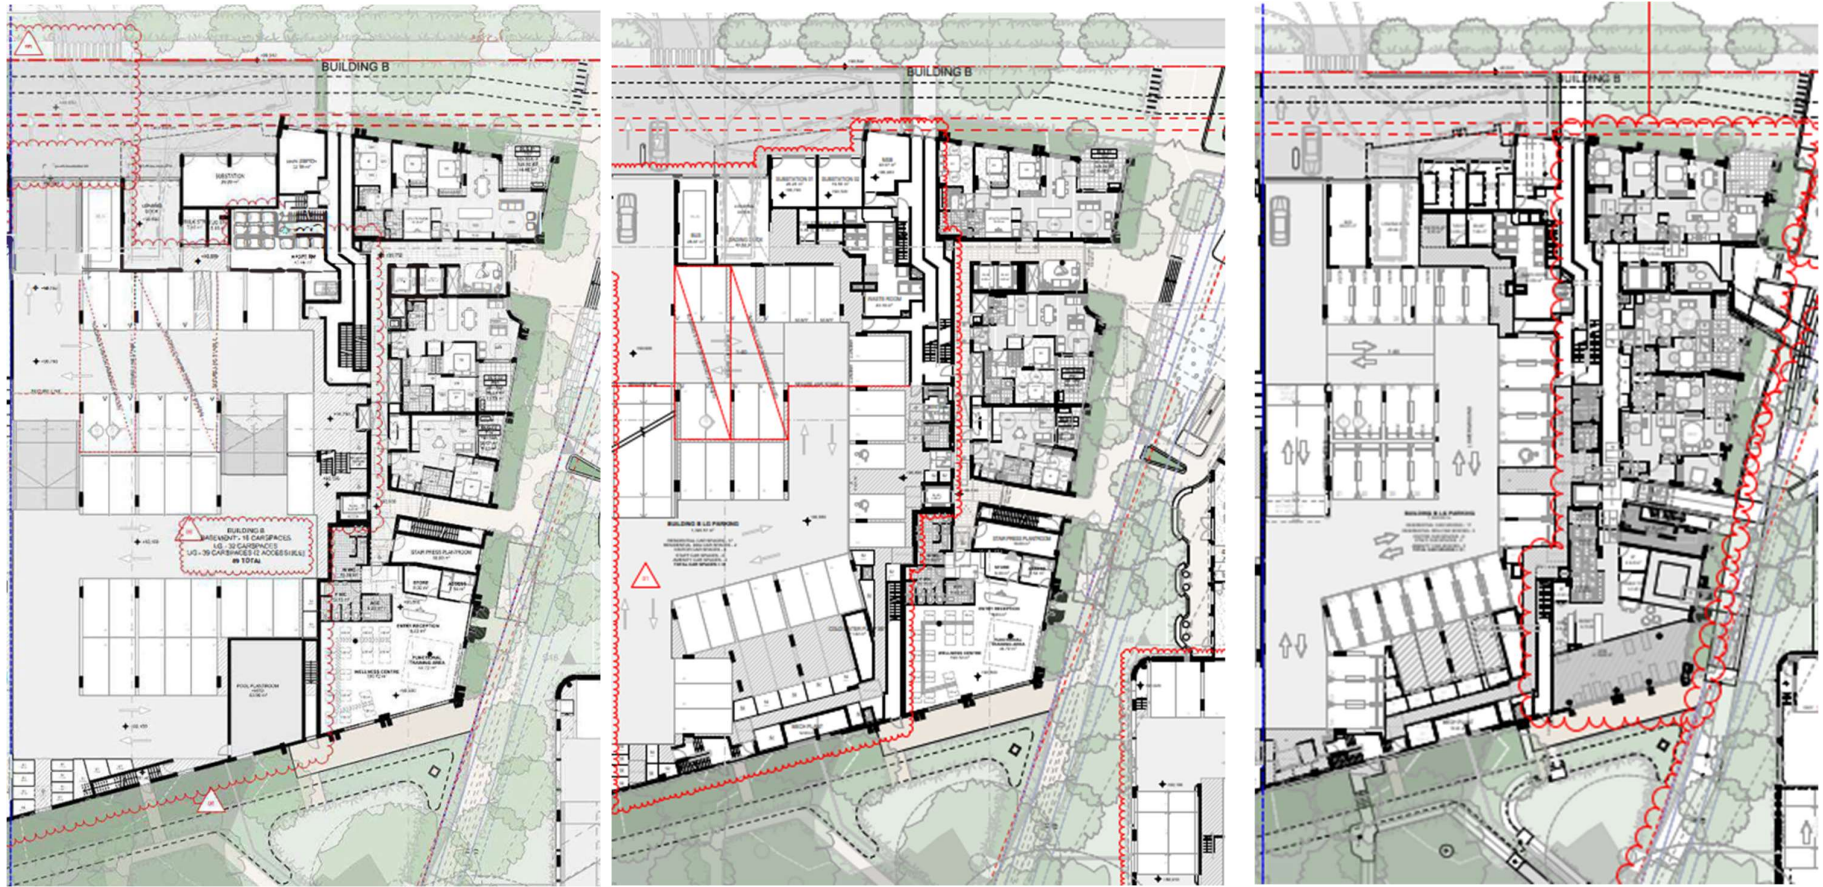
Originally Approved, DA MOD 1 and Proposed Lower Ground (LG) of Building B (1 of 2)
